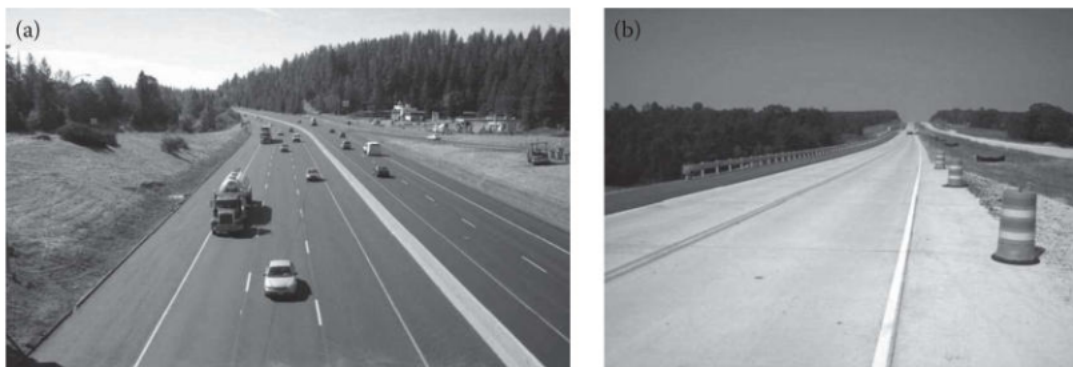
(a)Example of asphalt pavement, (b)Example of concrete pavement
